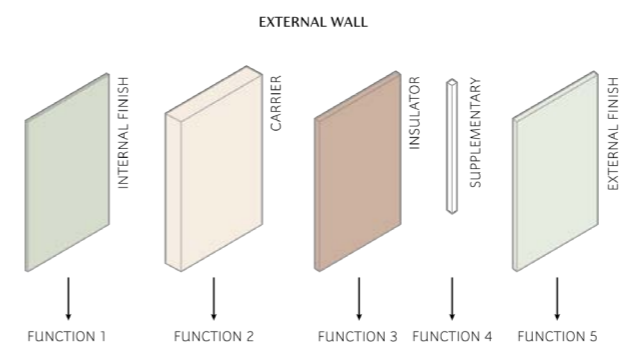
Deniz & Doğan (2014) External wall layers
